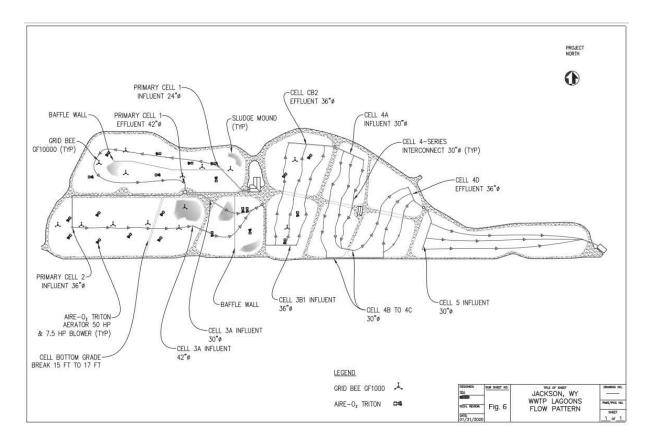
Lagoons Flow Path Vista Engineering L.L.C. 2021. Town of Jackson Water and Sewer Systems Evaluation Report.
